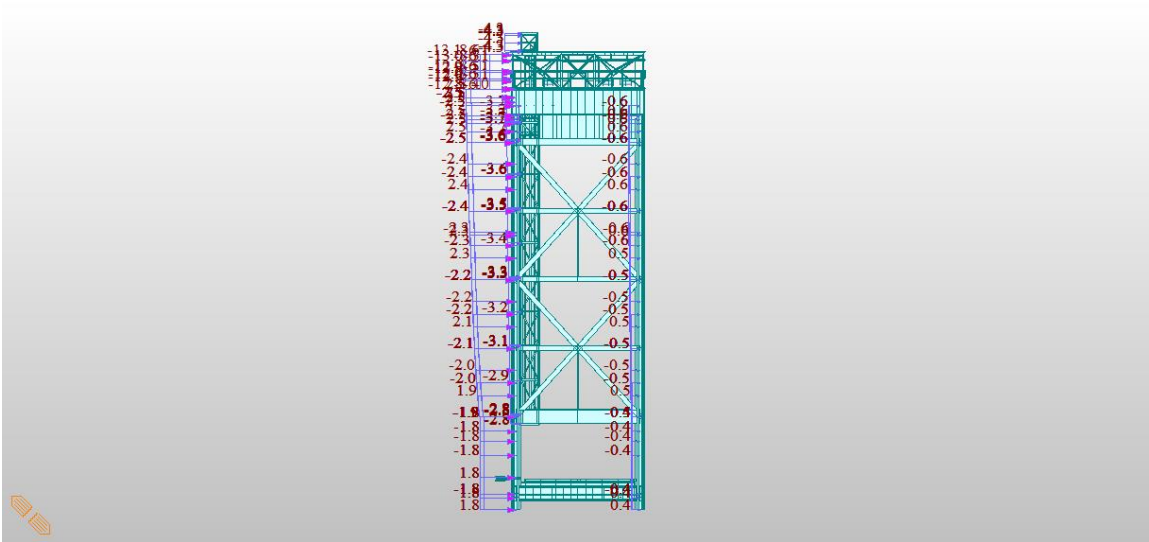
Wind Load Horizontal 2 (West to East) – Tower
